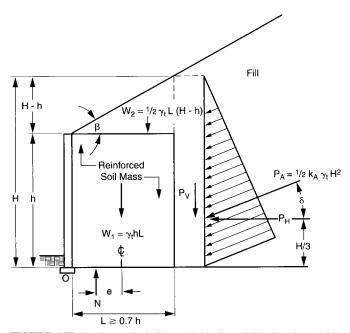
Design analysis for mechanically stabilized earth retaining wall having sloping backfill. (Adapted from AASHTO, "Standard Specifications for Highway Bridges," 16th ed., American Association of State Highway and Transportation Officials, Washington, DC.)
